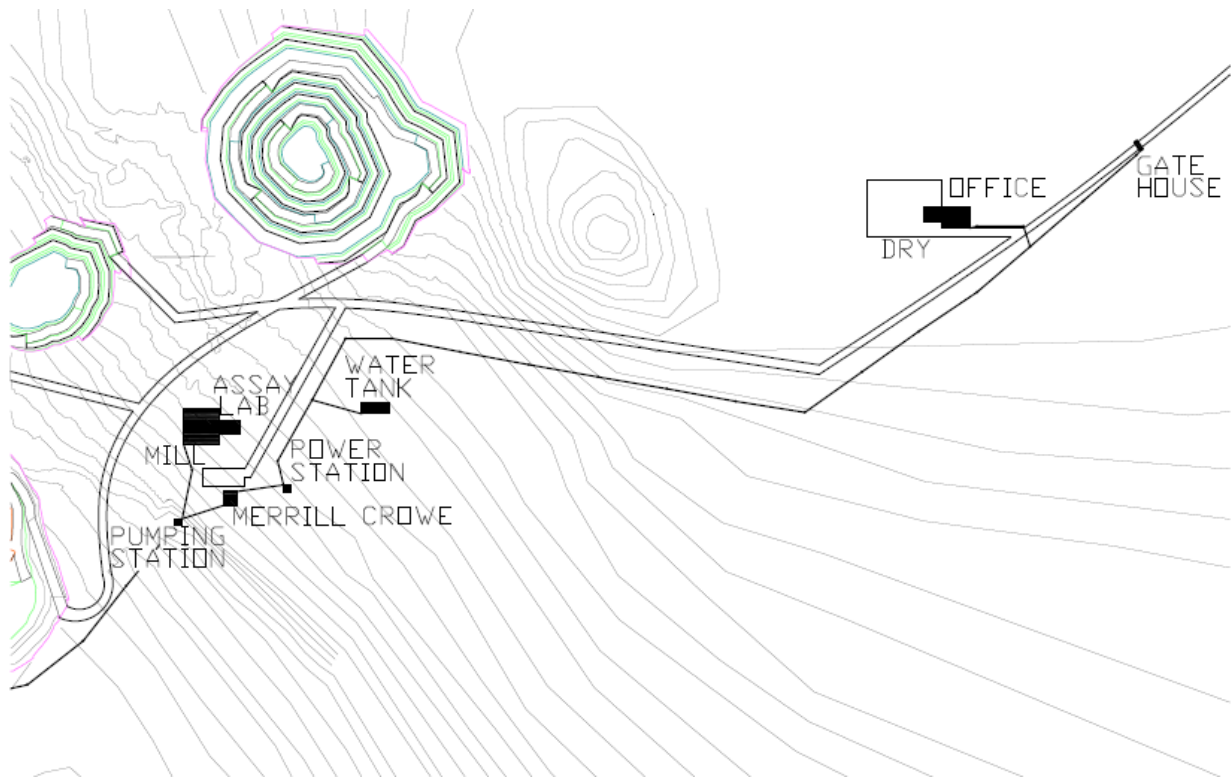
Detailed site layout of the majority of the infrastructure and open pits
